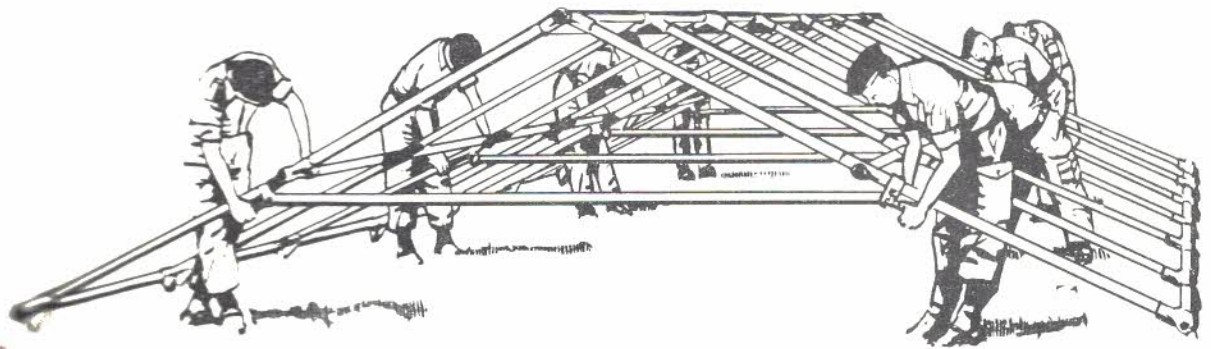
FITTING HORIZONTAL TUBULAR LOCKING BRACES
